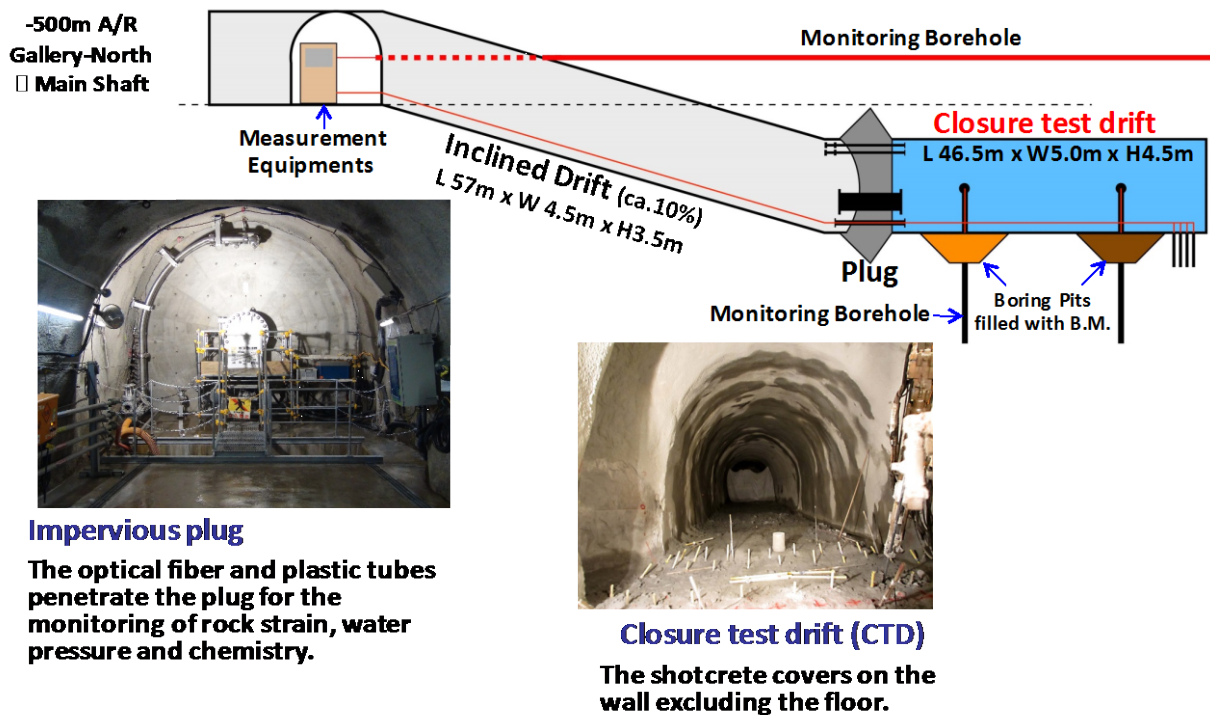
Schematic showing GREET tunnel design in a cross-section and photos taken during construction (Iwatsuki 2016).
